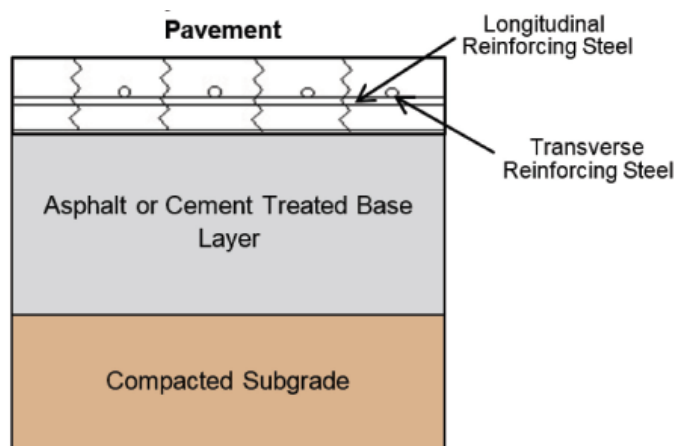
Continuously reinforced concrete pavement (Not to scale) (T. J. Van Dam et al., 2015)
